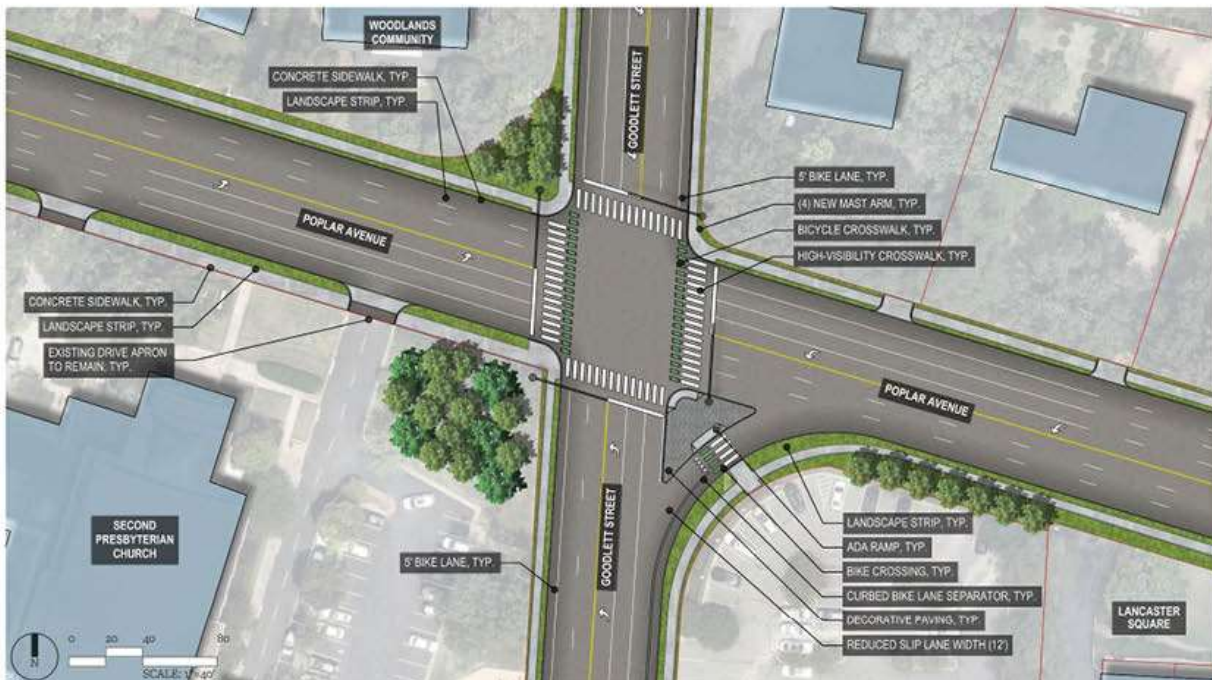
Poplar Avenue at Goodlett Street Existing Aerial and Concept Plan
